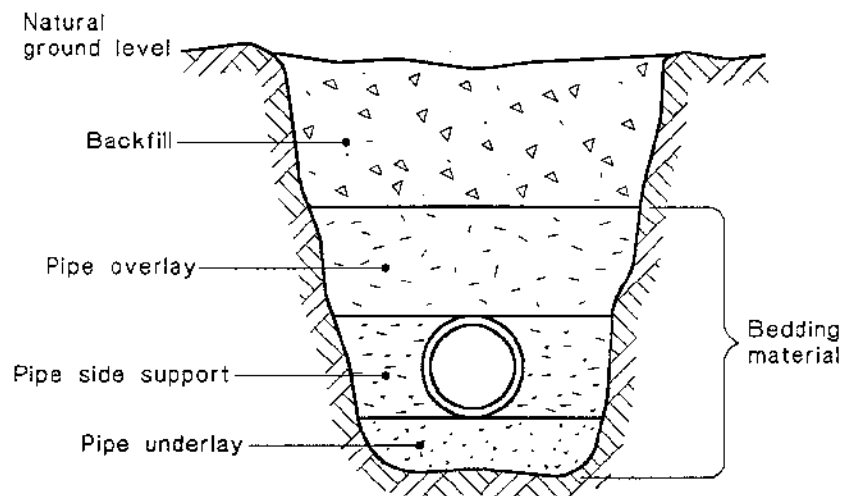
LAYERS IN A TRENCH INSTALLATION
